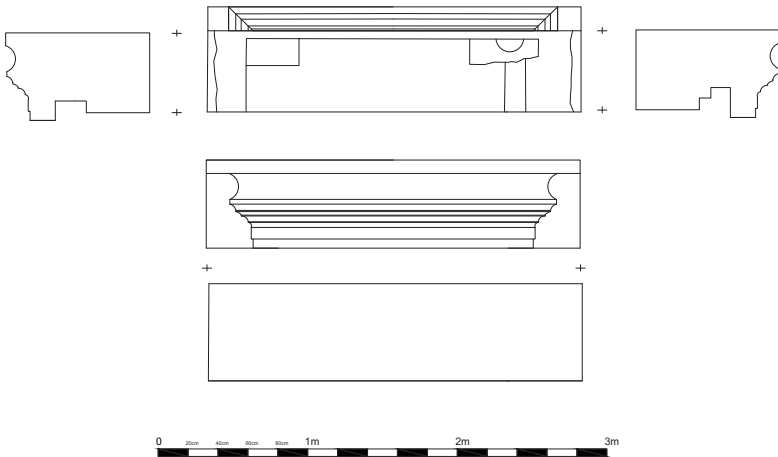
B10 Lintel with Architrave-frieze and Section Drawings
